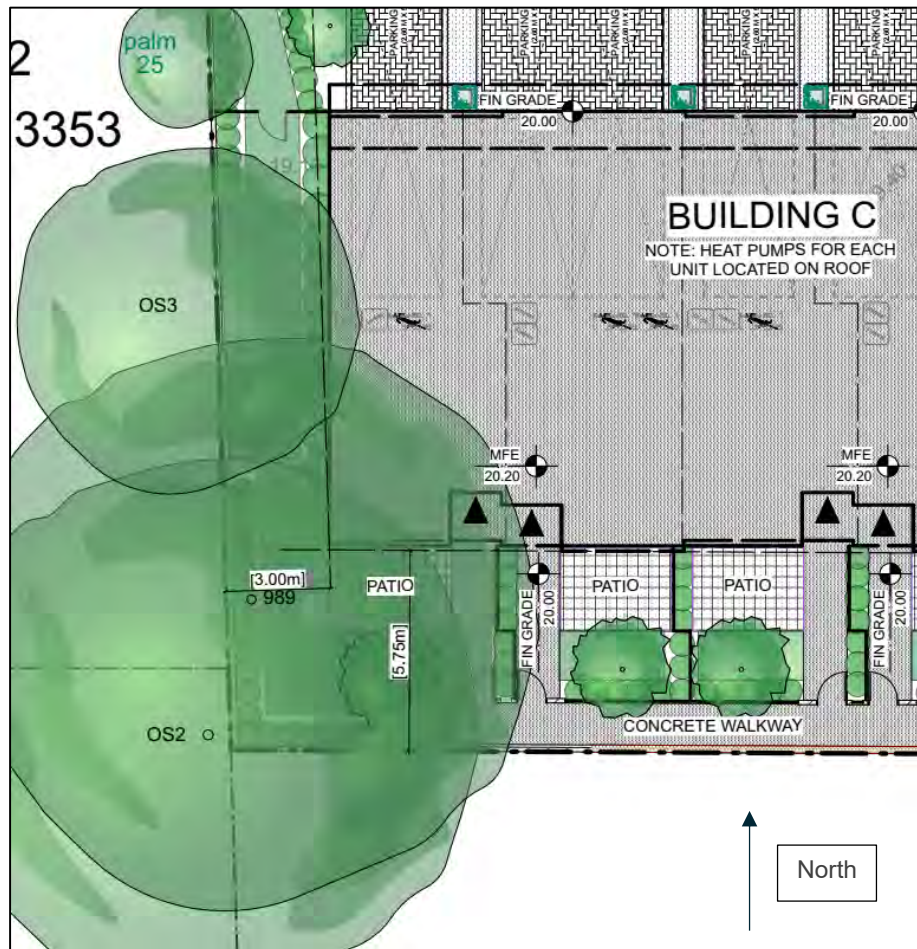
Snapshot from the preliminary building plans July 31st, 2025) showing the foundation wall proposed within the CRZ. Not to scale.
